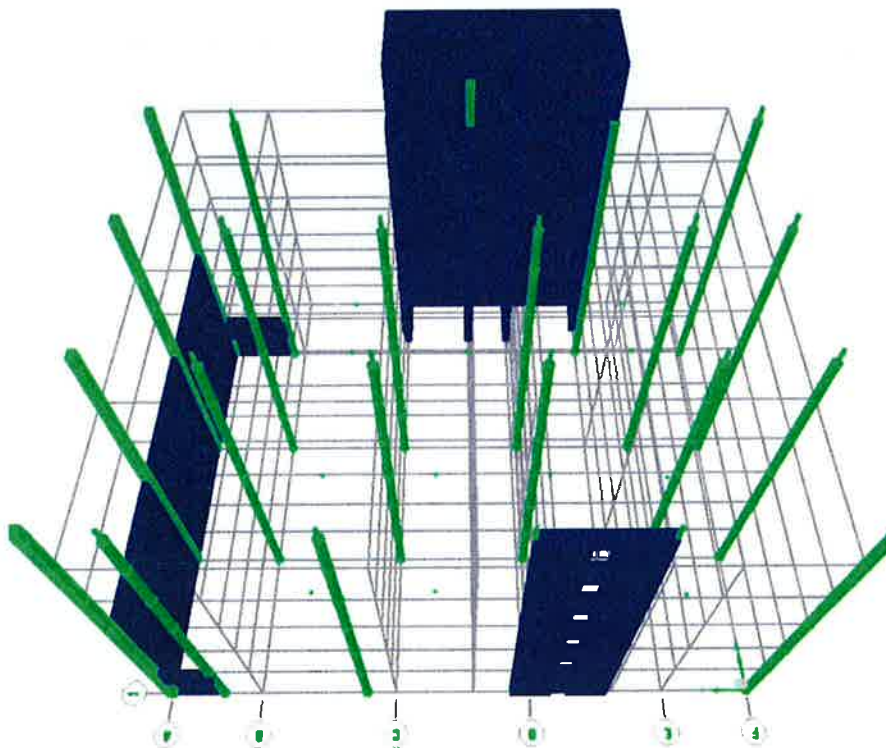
3-D view of ETABS model 1c showing layout of concrete shear walls, concrete masonry walls and columns (beams are not shown in this view for clarity).
